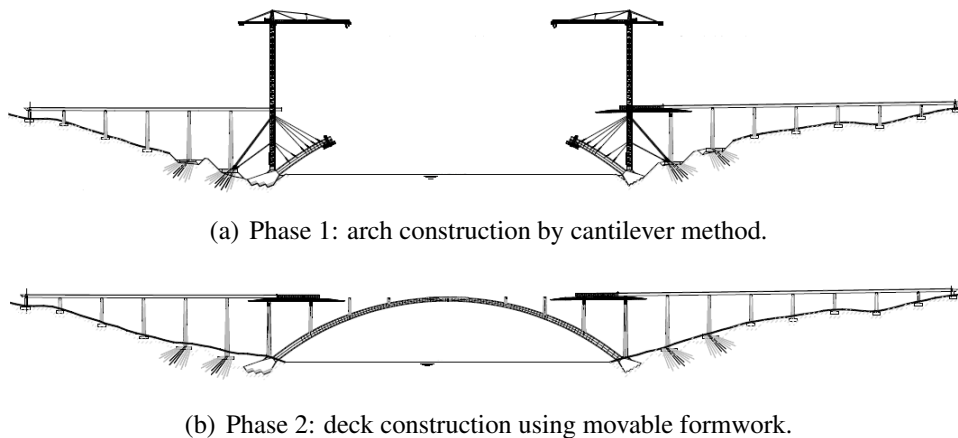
Main construction phases of the viaduct. Source: construction blueprints.
